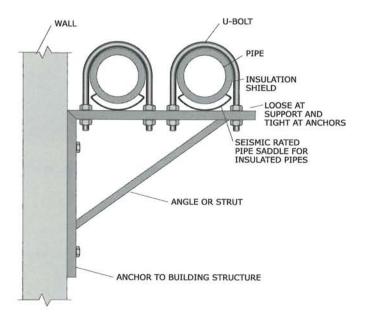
Attachment to studs in the wall with pre-manufactured brackets.
